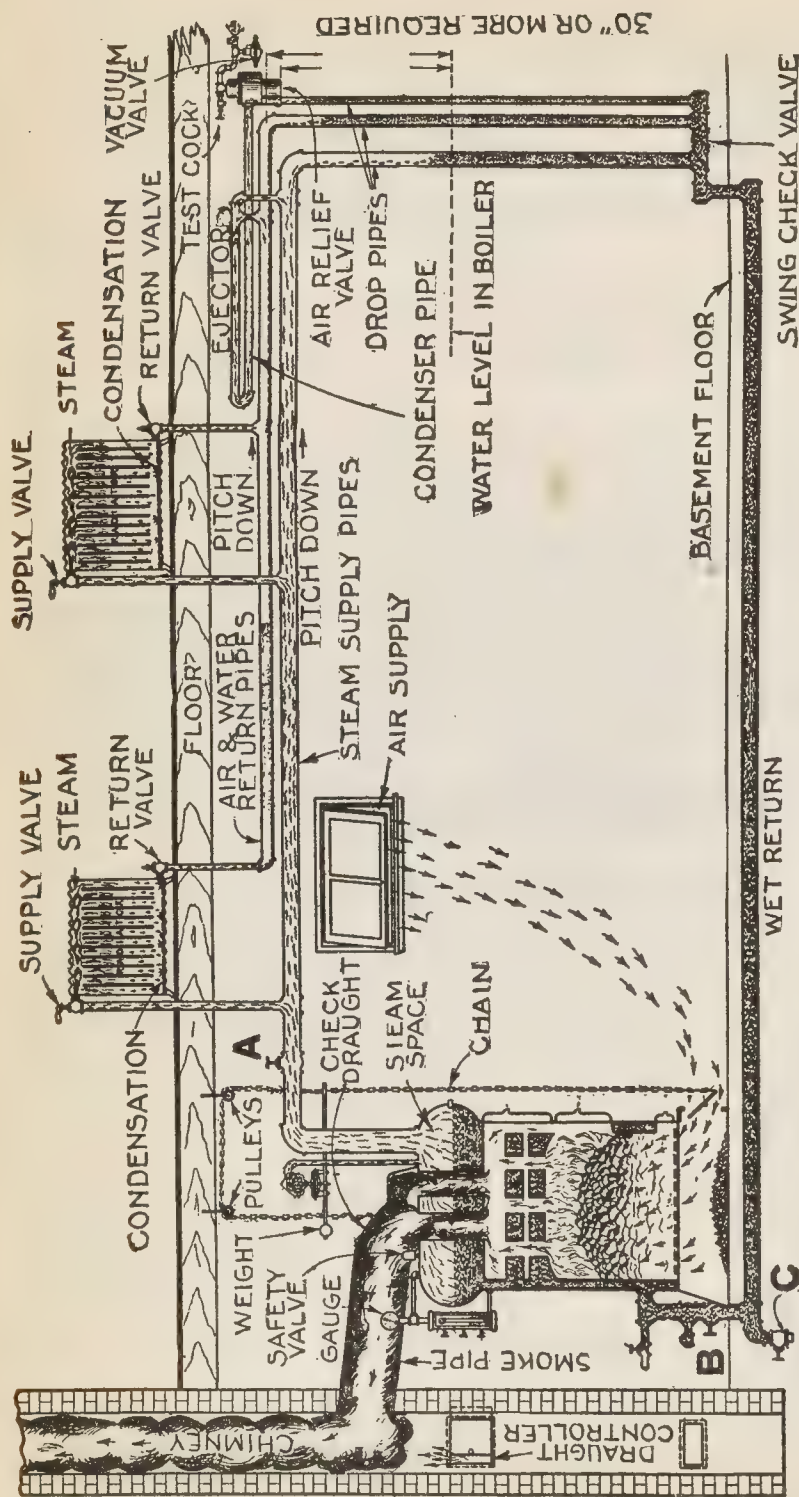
,475.—Sectional view showing construction and operation of Moline mechanical vacuum system. In operation, the heat expands the air in the boiler and pipes, driving it through the *ejector* at a speed which creates a slight suction on the return pipes. This suction pulls the air out of the return pipes and radiators and through the ejector. The air passes from the ejector into the *condenser* and from there out into the atmosphere, through an air relief valve. Before all the air is discharged, the water boils and a vapor is generated. This vapor is at first under a few ounces of pressure, and follows the easiest course, filling the supply pipes and radiators before it reaches the return pipes. When all of the radiators are fully heated, the surplus vapor enters the return pipes and passes through the ejector into the small condenser pipe. The condenser pipe acts as a chamber for collecting the mixed air and vapor and protects the air relief equipment. The air valve automatically closes after the air is expelled, being actuated by the heat of the vapor. As the steam condenses a vacuum is formed, the radiators giving off a mild heat.
